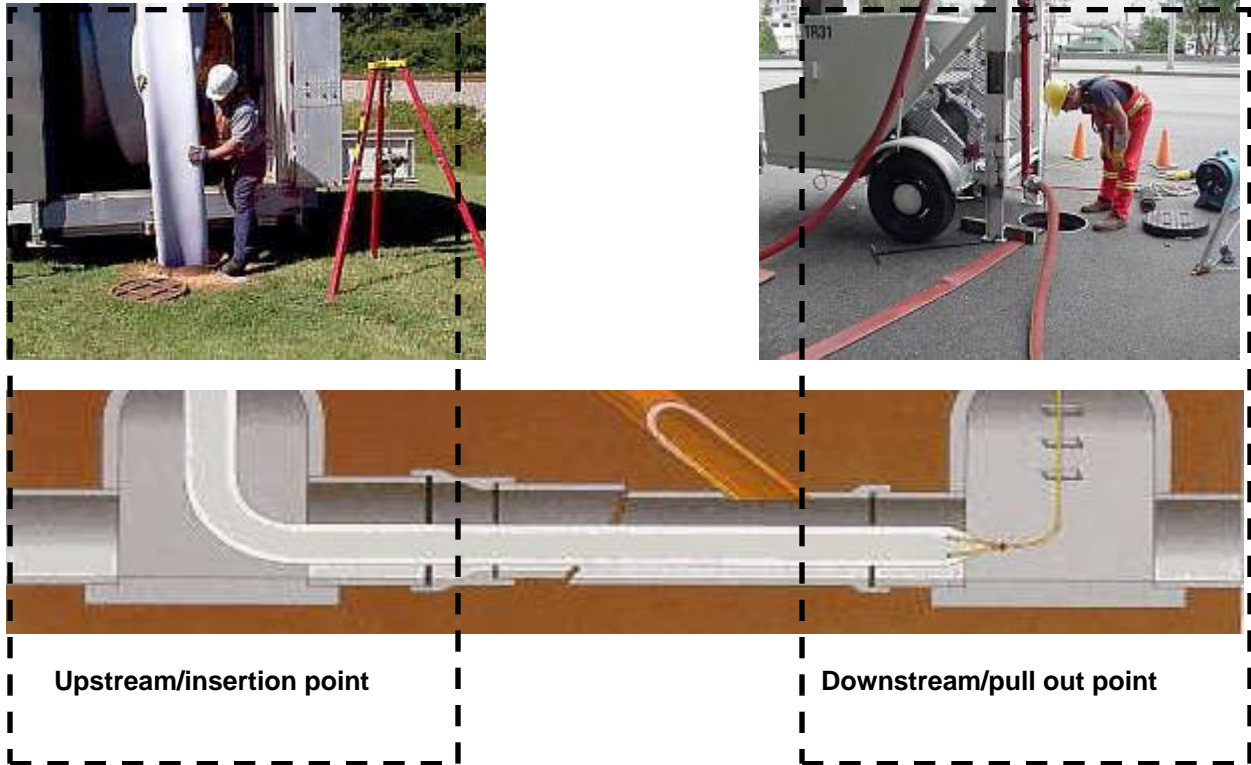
General Site Layout for Thermoformed Pipe (Source: Ultraliner Inc.)
